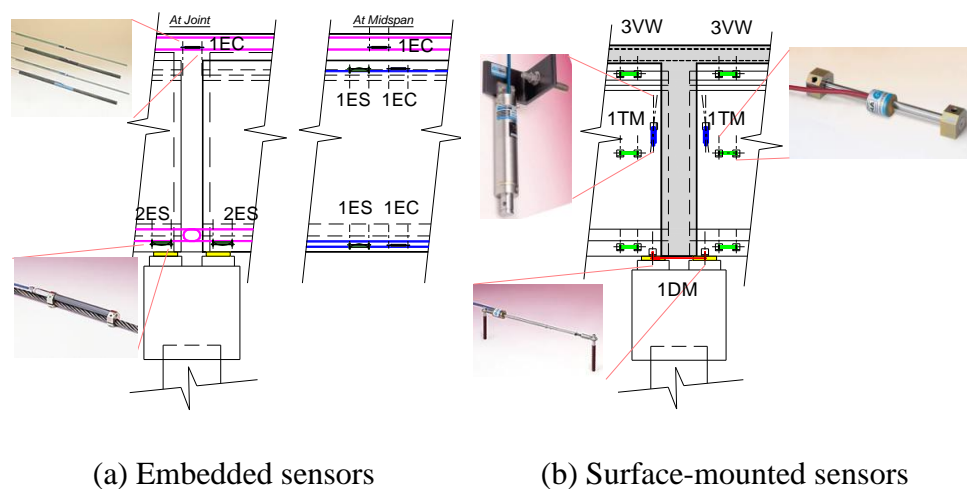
Sectional locations of embedded and surface-mounted sensors in Bridge #2
